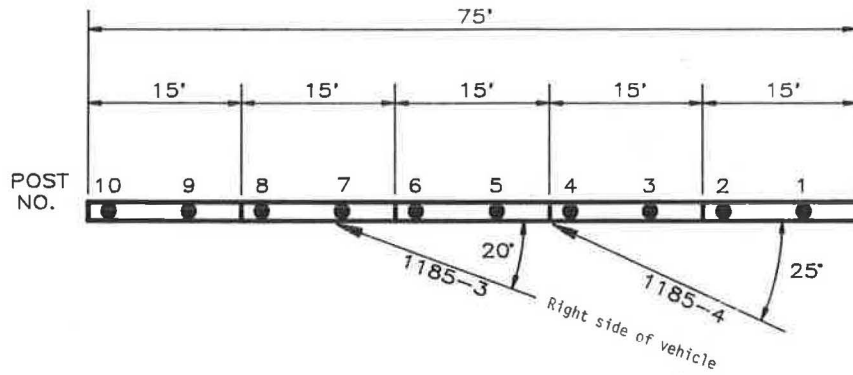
Plan view of T421 bridge rail installation and vehicle impact points.
